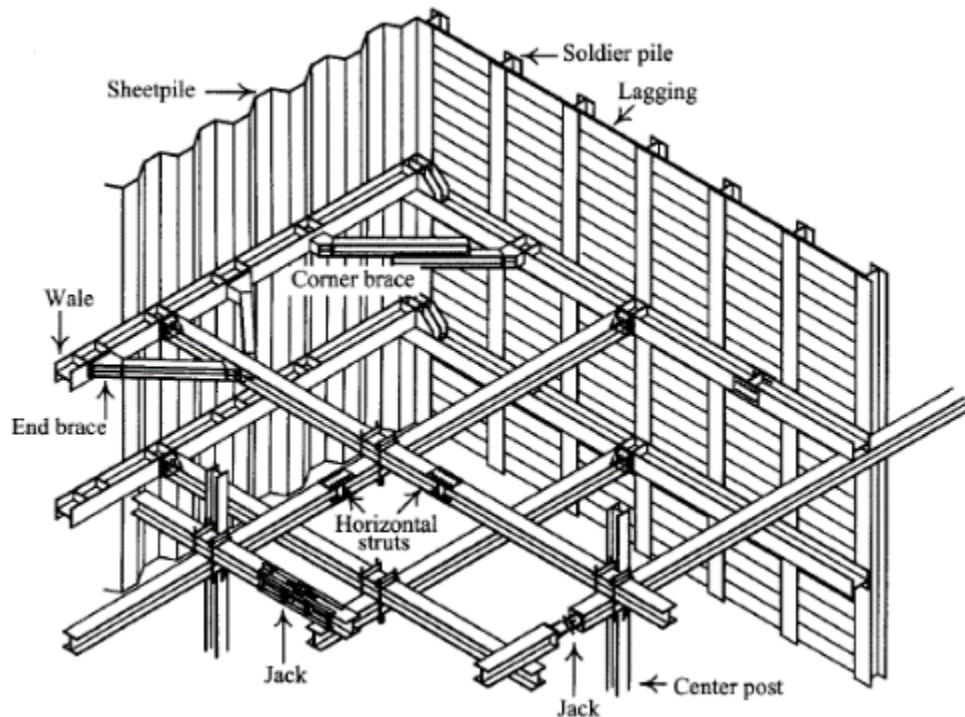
Typical structural components of a braced excavation. After (Ou 2006).
